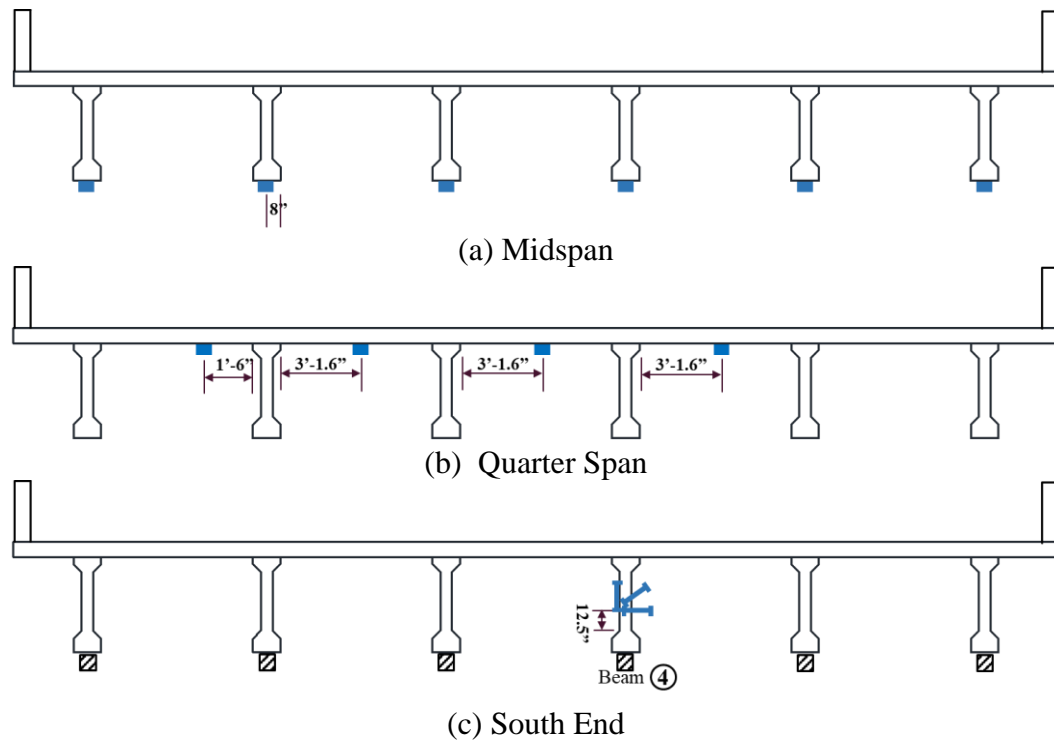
Sensor Layouts for Bridge #1 (Cross Sections).
